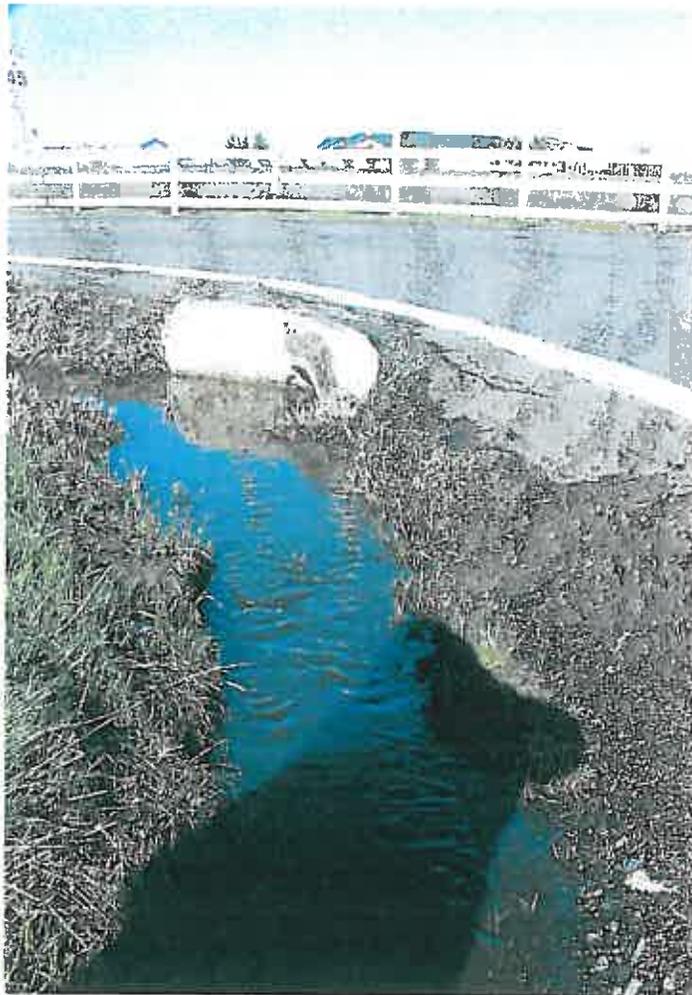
Highpoint in Byron Highway ditch restricting drainage
